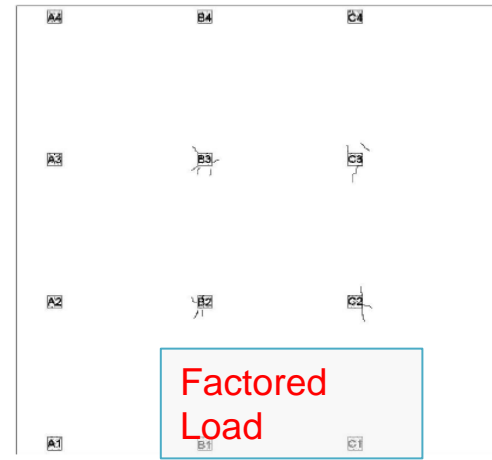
Top of Slab Crack Pattern at Factored Load
